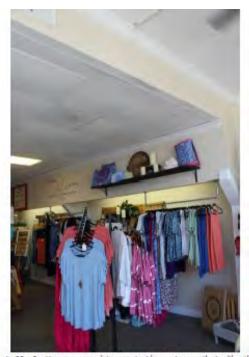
Southern commercial space, looking east; acoustical ceiling tiles
